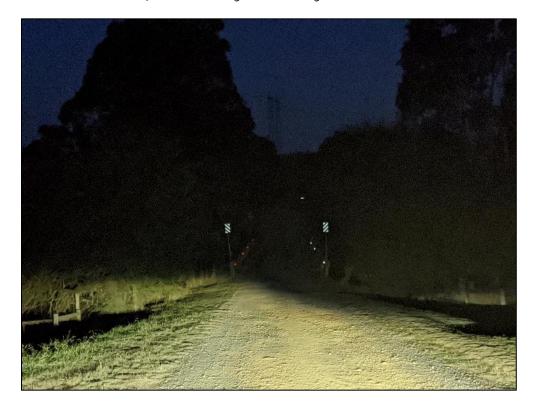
Johnson Creek bridge – Facing south-east (NIGHT)
